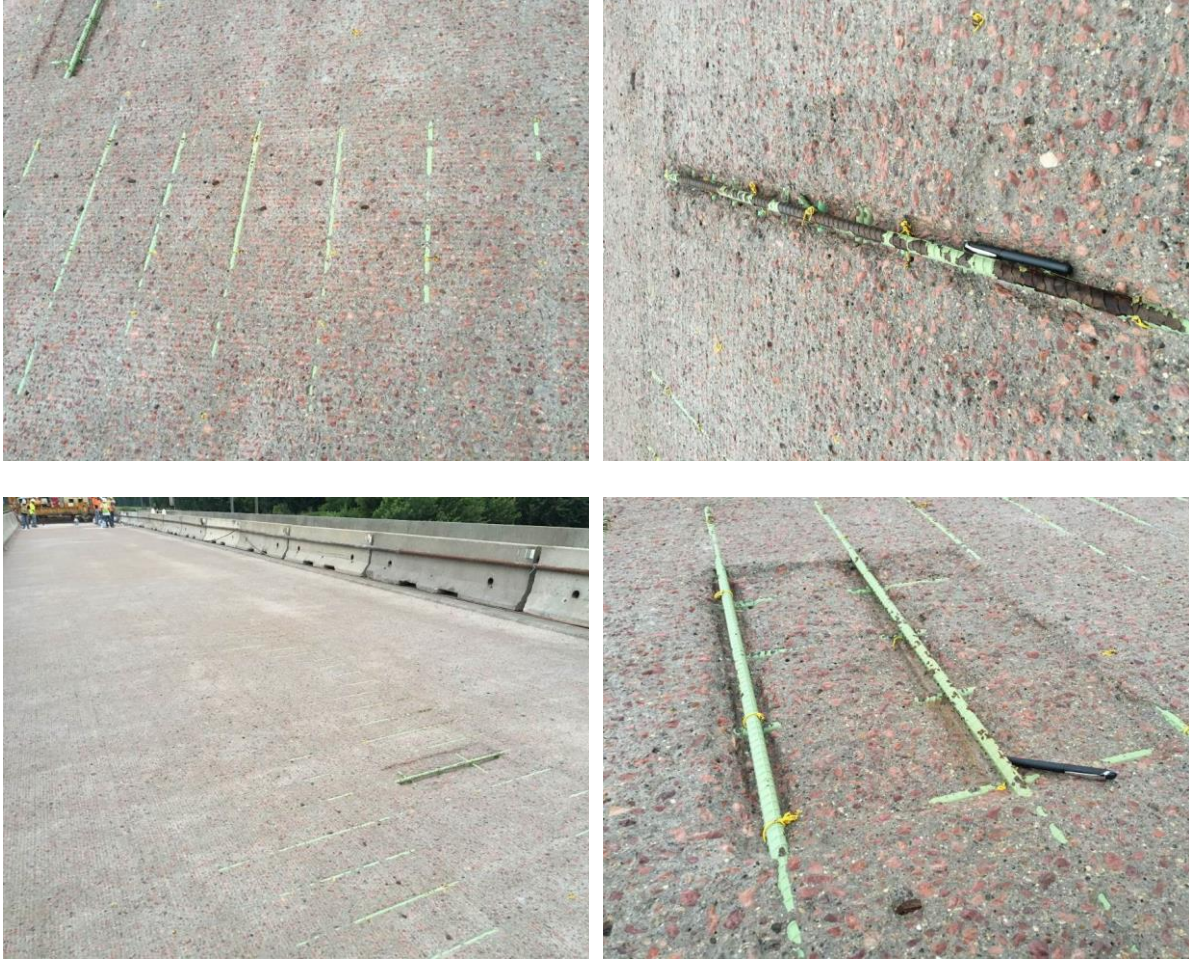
Surface condition of bridge deck of site C2 prior to overlay
